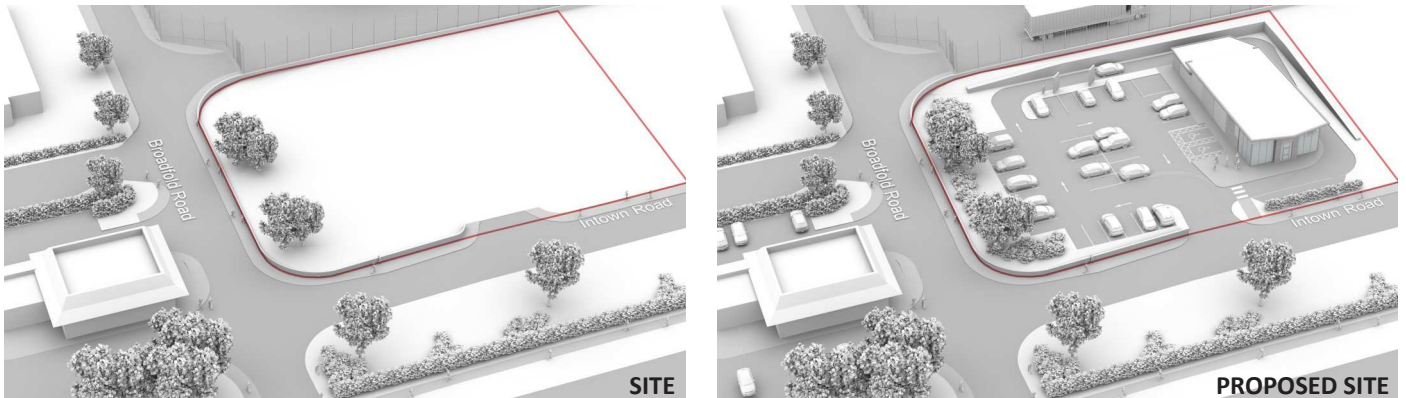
The application site is currently vacant following the demolition of the previous car showroom that occupied the plot. The site is surrounded predominately by mixed uses, with a McDonalds drive-through restaurant occupying the land directly to the south. The proposed site layout attempts to be as sympathetic as possible to the existing site topography and existing access points. The proposed building is therefore located to the northern edge of the application site.
